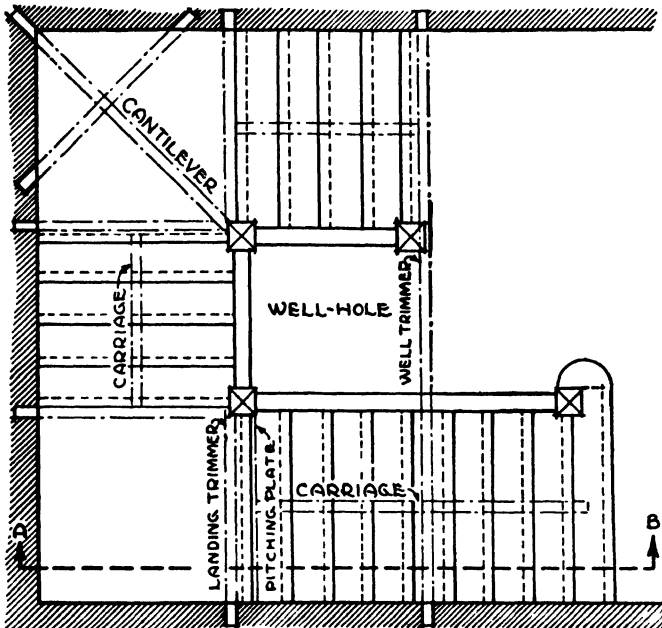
Plan of Open-Well Stair with Two Landings and Closed Strings
